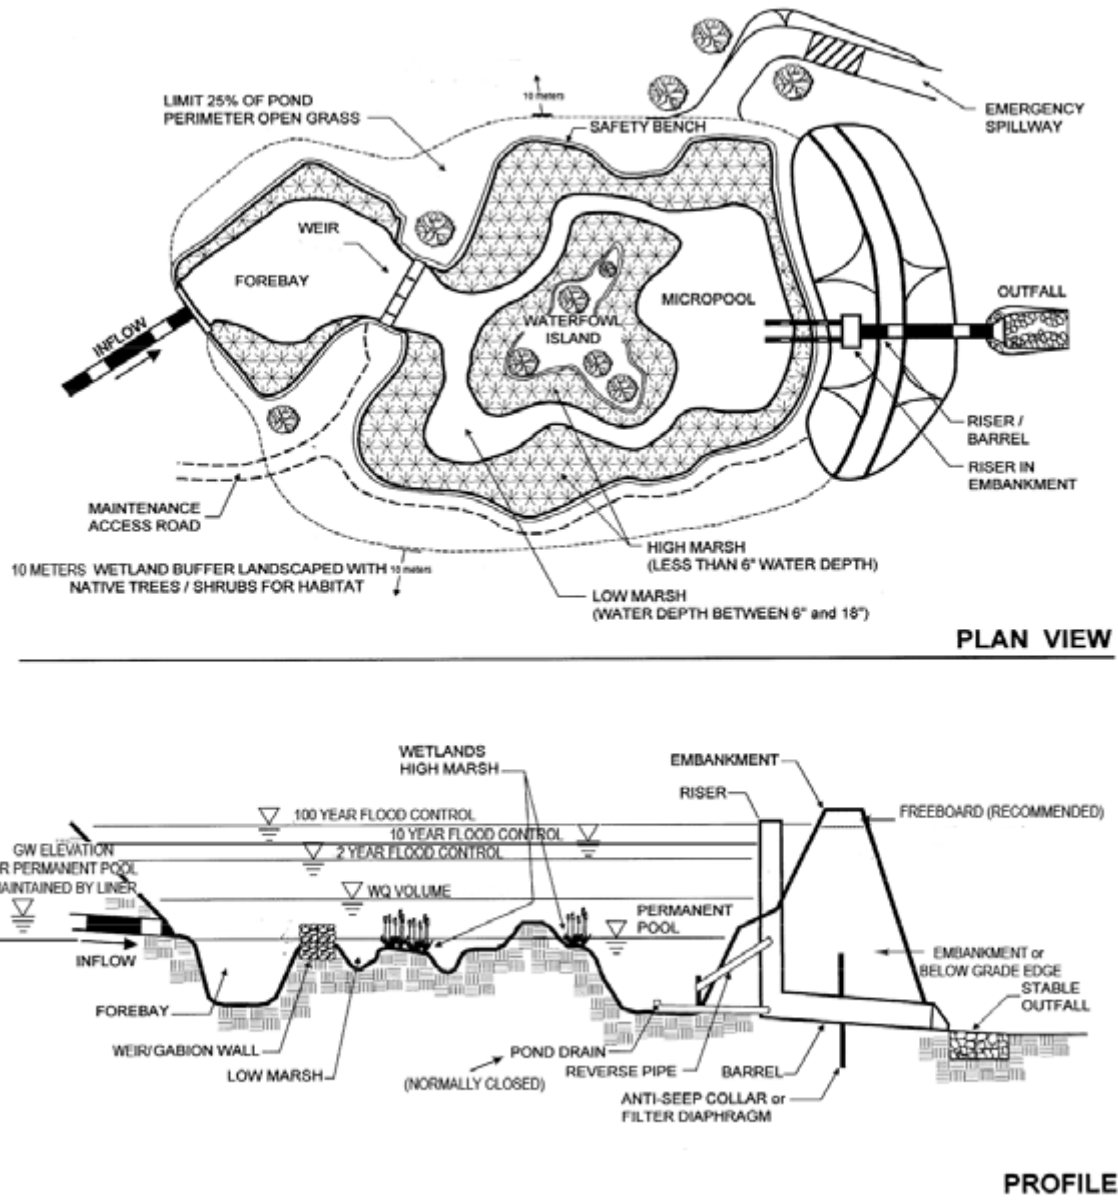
Example of constructed stormwater wetland, shallow marsh type
